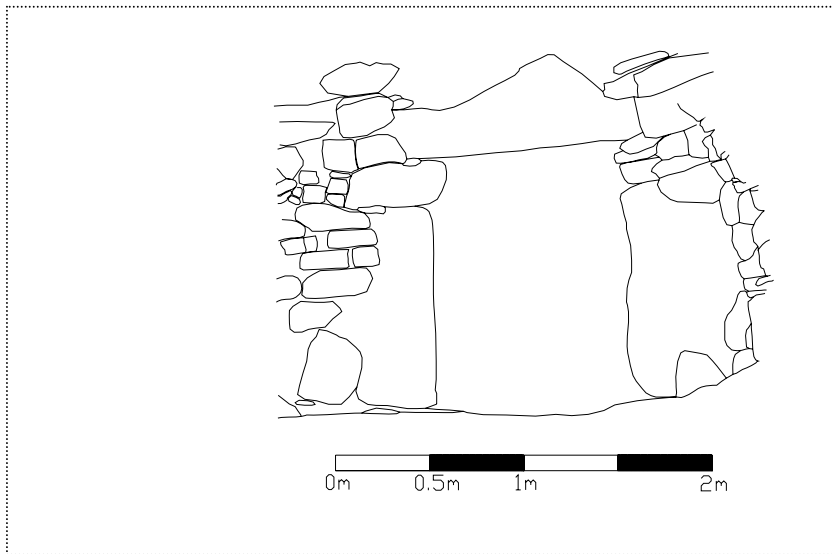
South facing elevation of lintelled doorway at junction between gallery 3 & gallery 4
